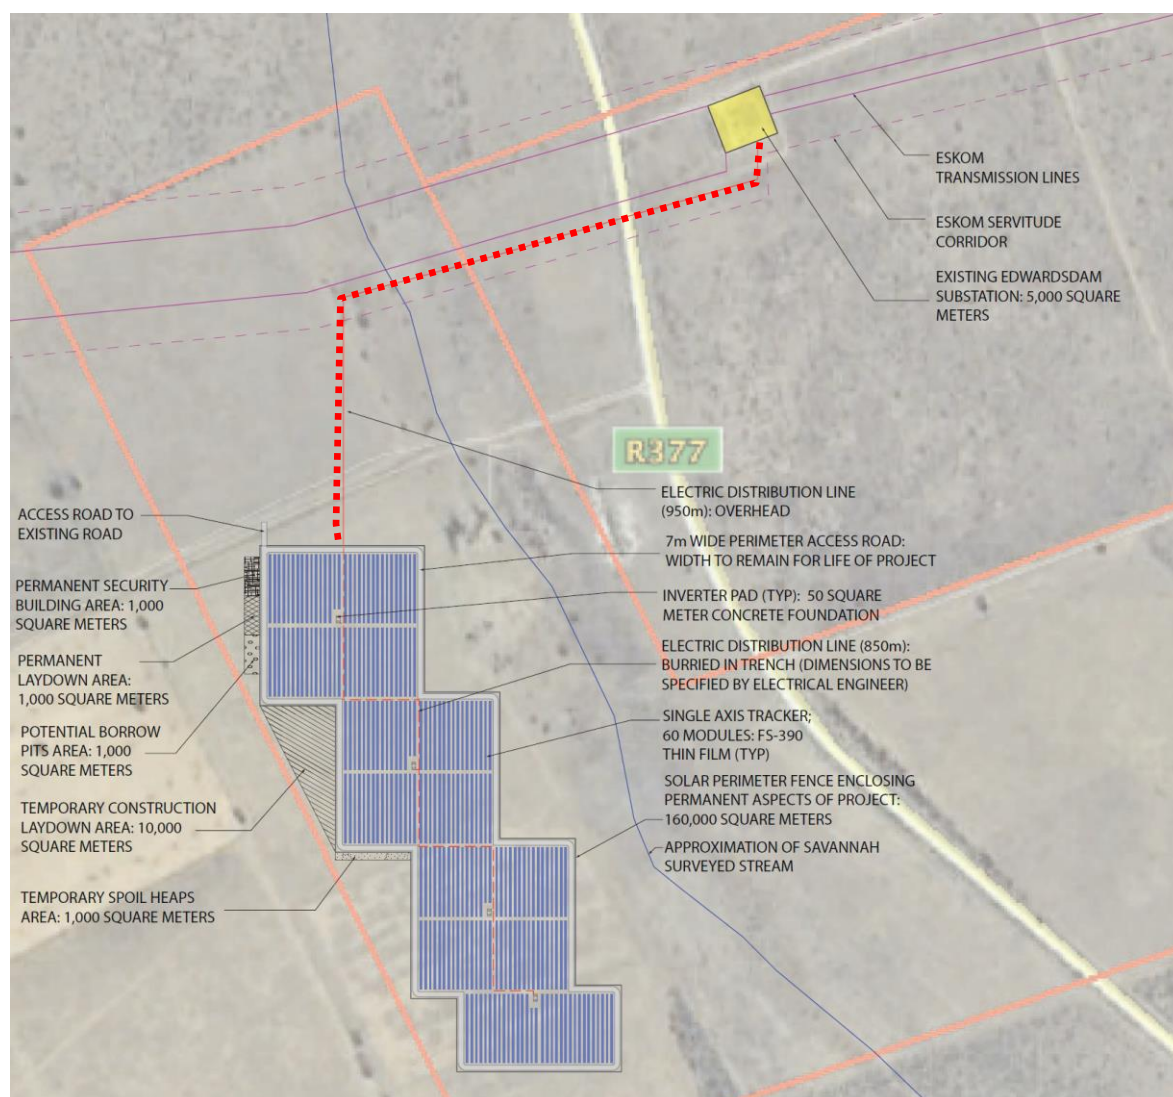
5MW PV footprint west of the R377 indicating power line Route Alternative 1 (red dotted line) running parallel to existing roads
